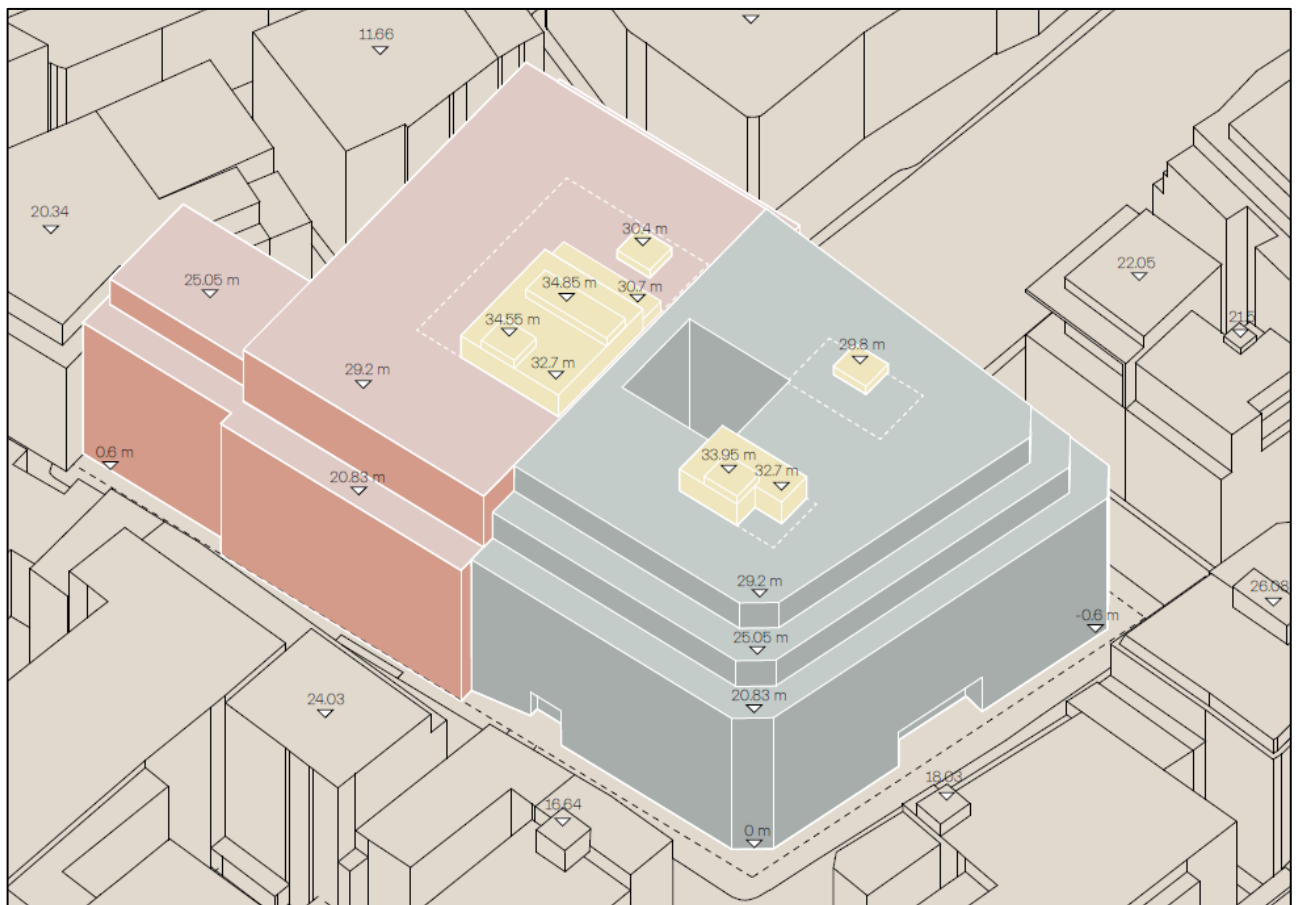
The 'spot heights' of the proposed building. The areas marked in yellow denote the parts of the building which exceed 30 metres in height.
